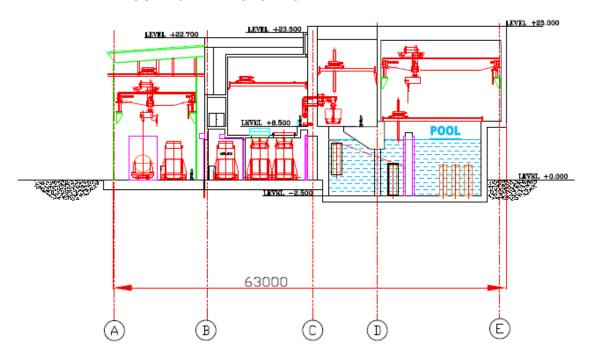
WET STORAGE FACILITY ELEVATION VIEW 13.2.4 Specific Safety Features Wet Storage
